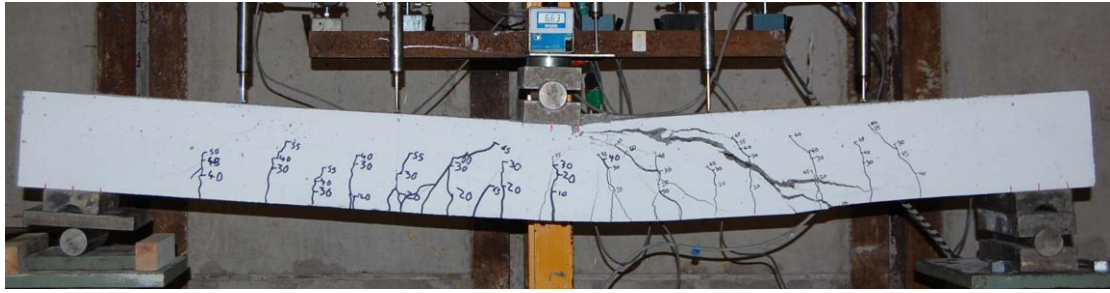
Crack pattern for specimen 9C-U-S at failure
